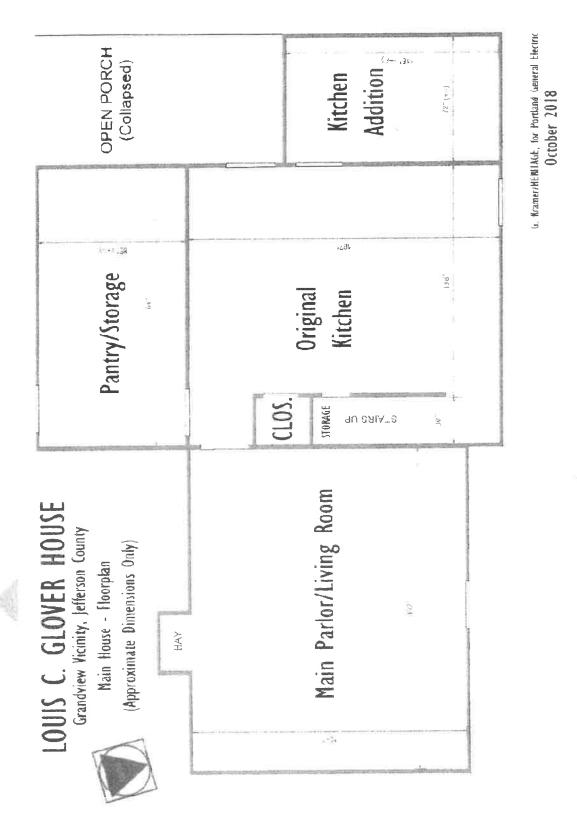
Louis C. Glover House, Main Floor Plan (not to scale), G. Kramer (Oct 2018)
